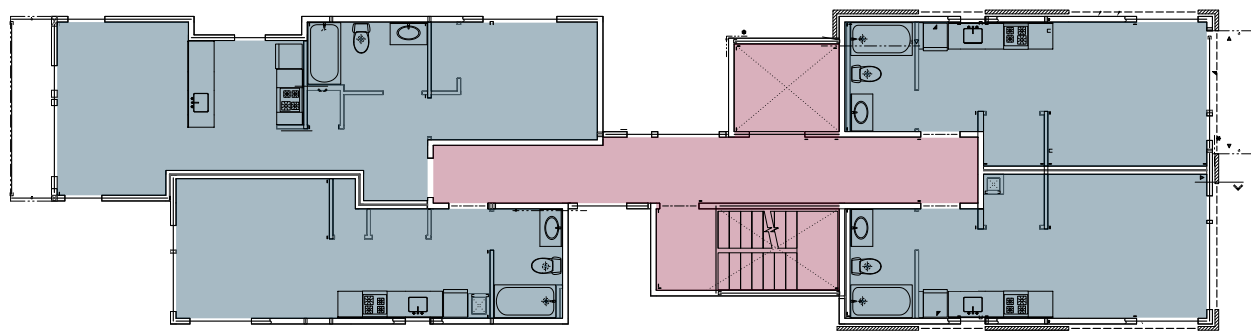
Adapted framing plan for a typical upper level floor in 1823 13th Ave (1823 13th Avenue 2020). Colored unit diagram overlaid.
